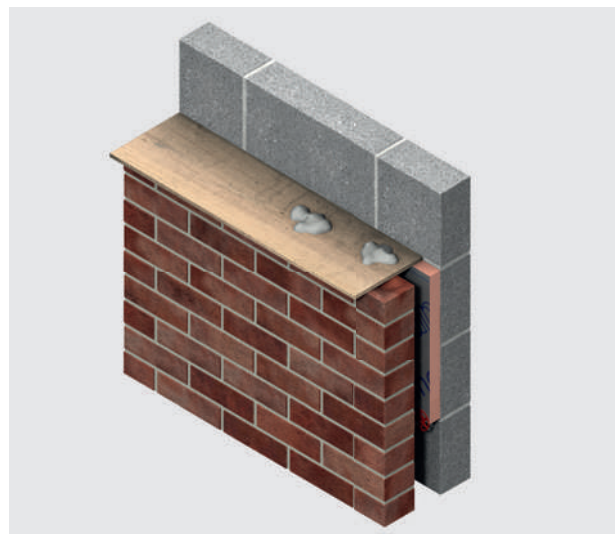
Use of a Cavity Board to Protect the Cavity and Insulation Board Top Edge
